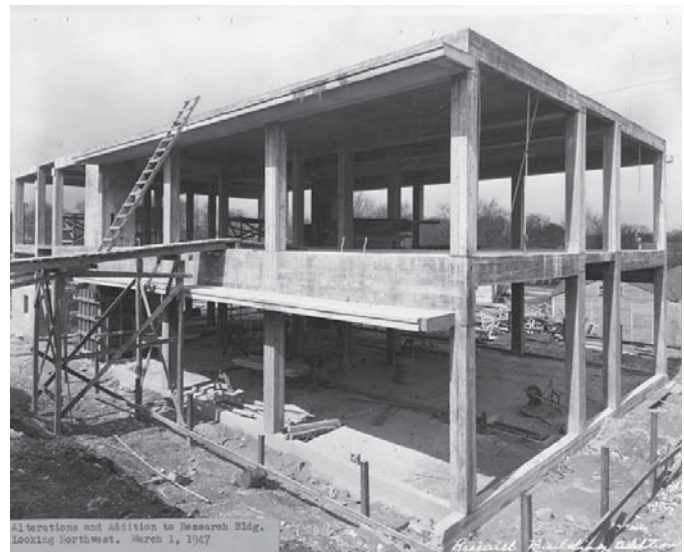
Calculator Building under construction, March 1, 1947. Georgia Tech Library, Archives and Special Collections.
